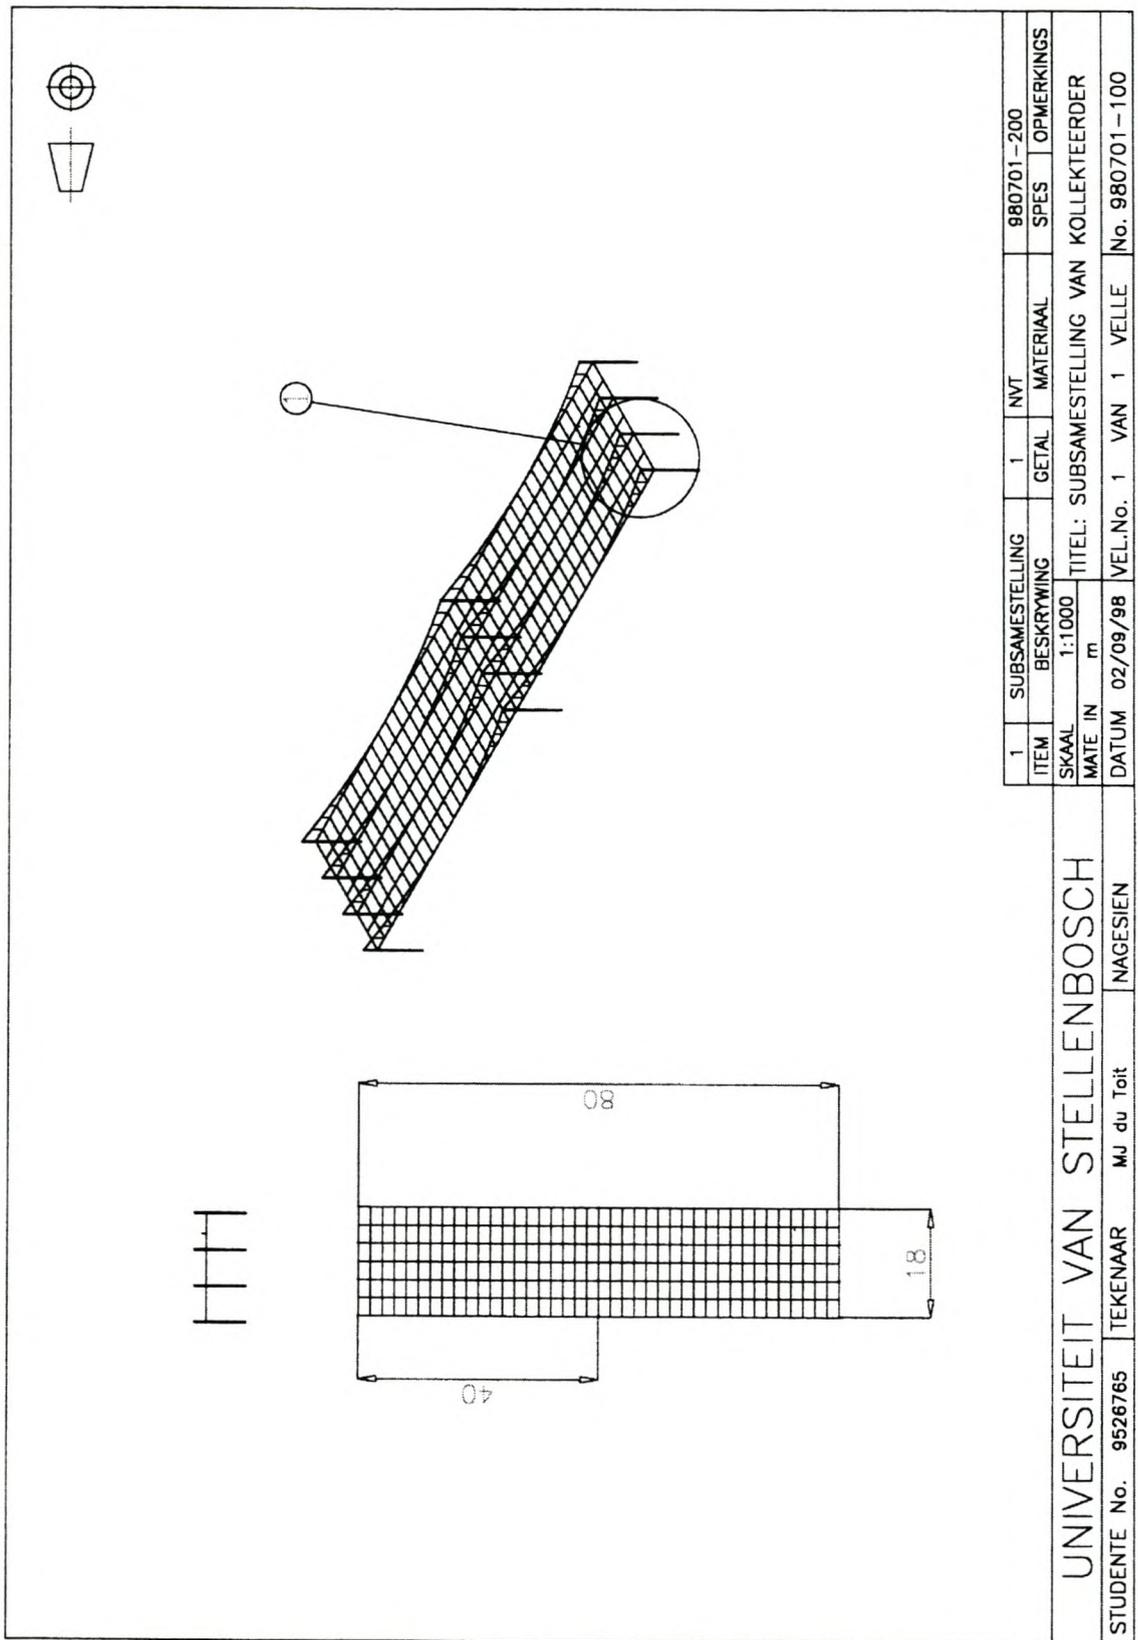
Solar Chimney Collector, Technical Drawing #2 [Roux et al., 1998]
